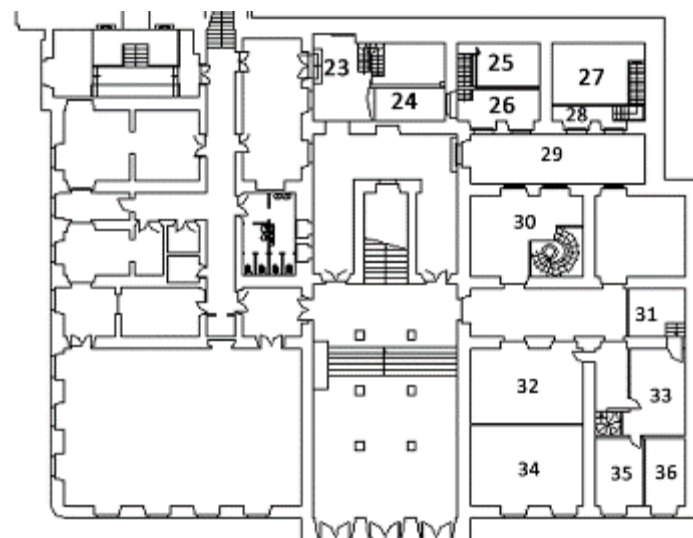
ROOMS USE IN THE INTERMEDIATE FLOOR BETWEEN FLOOR 0 AND 1
